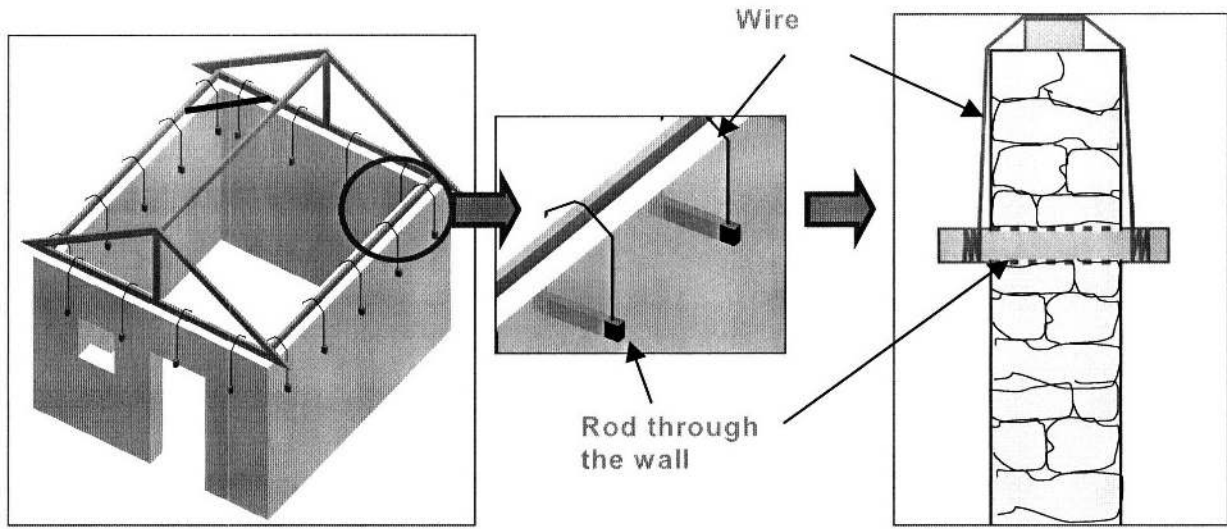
Roof-wall connection system using dowels and wires (Drawings by: Yanni Loukissas).
